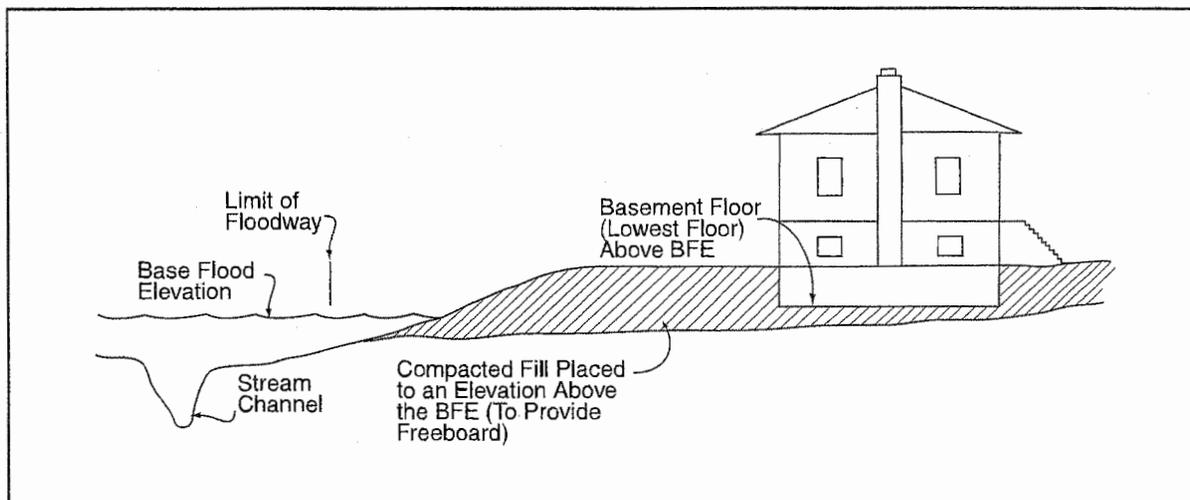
Basement foundation with lowest floor above the BFE. Damage from floods below the BFE is eliminated.
